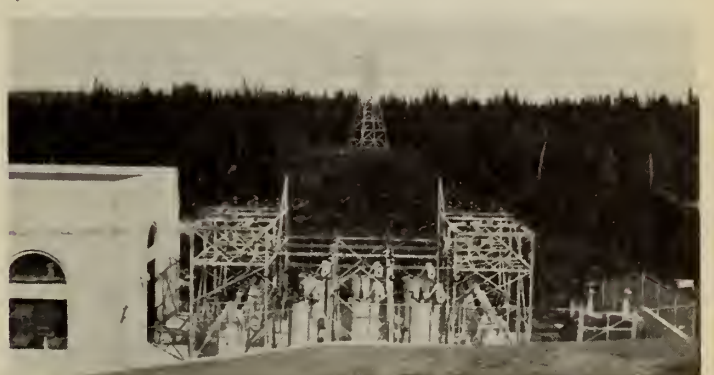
Outdoor Transformer and Switching Station at Outardes Falls
